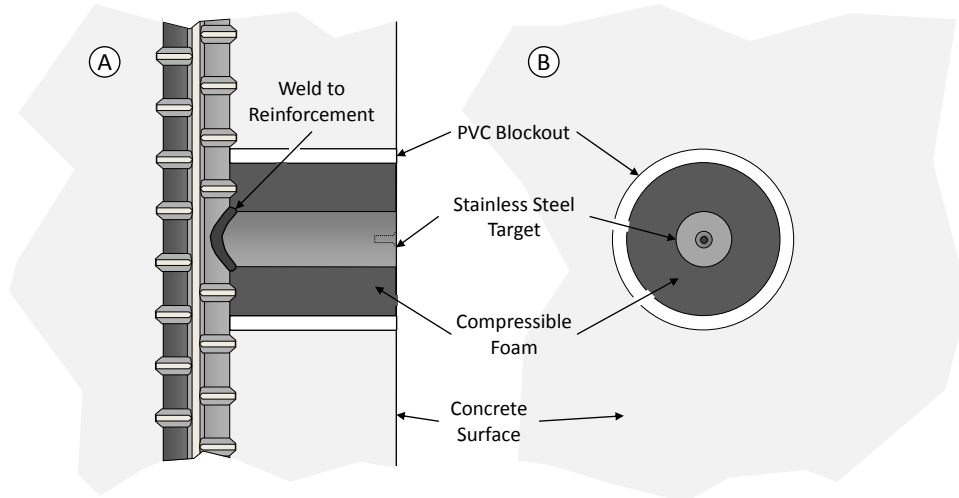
Measurement Target Detail (A) Section View (B) External View
